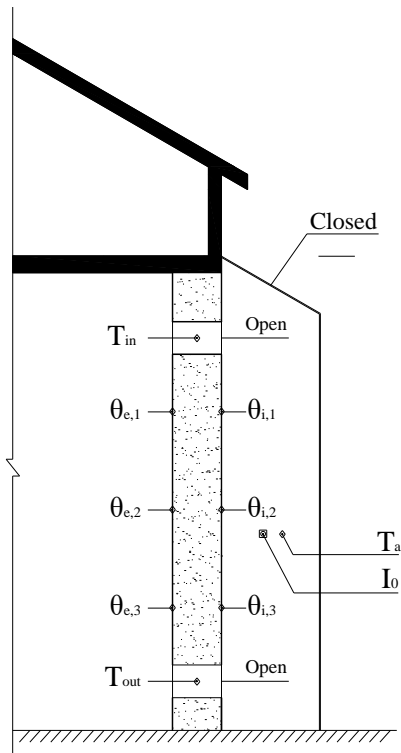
12. Schematic diagram of the section of the concrete collector wall.
